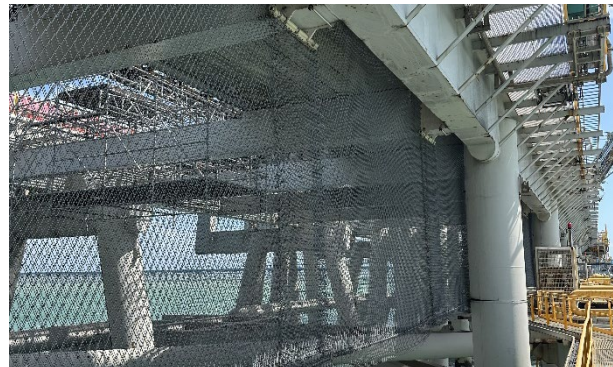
Continuous snapback system neatly installed between rail girder beams – BMA, (2024)
